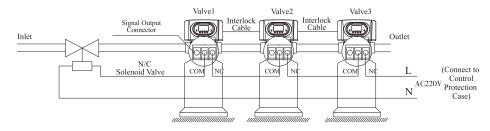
Wiring of Solenoid Valve on Inlet for Valve in Parallel and Series
